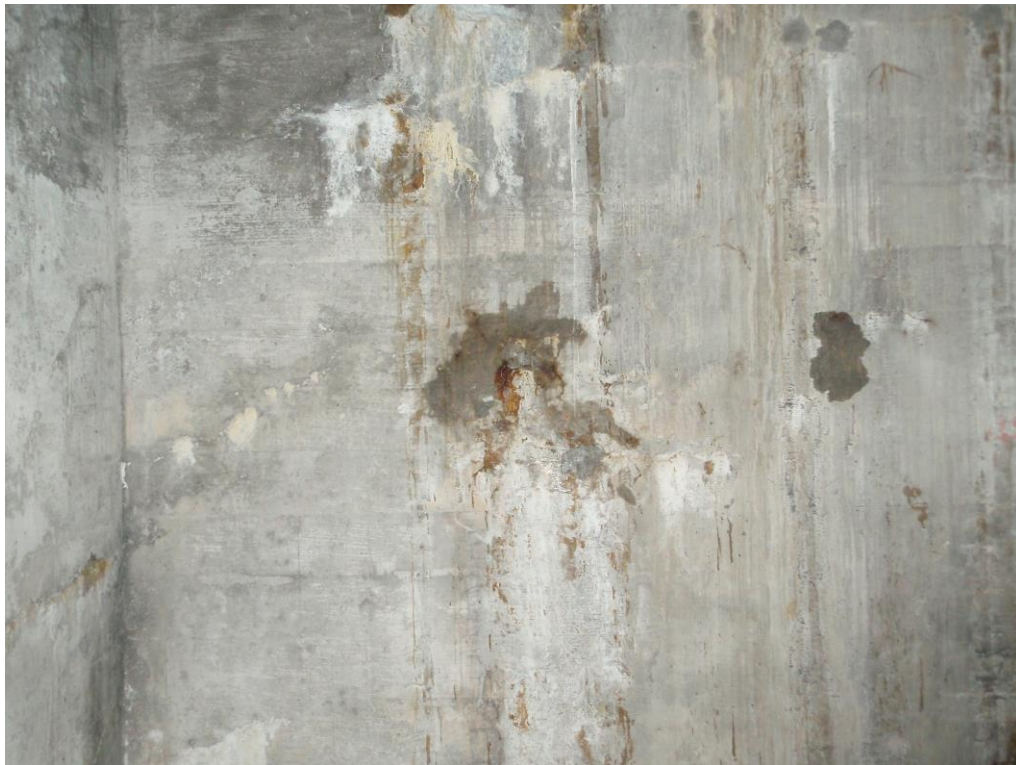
General view of concrete patch work on the northeast wall of the dry well. (March 15, 2018)
